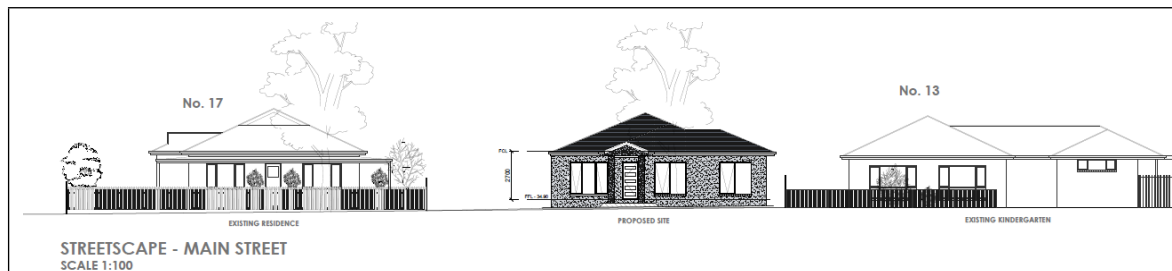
Revised streetscape plan showing Dwelling 1 as single storey
